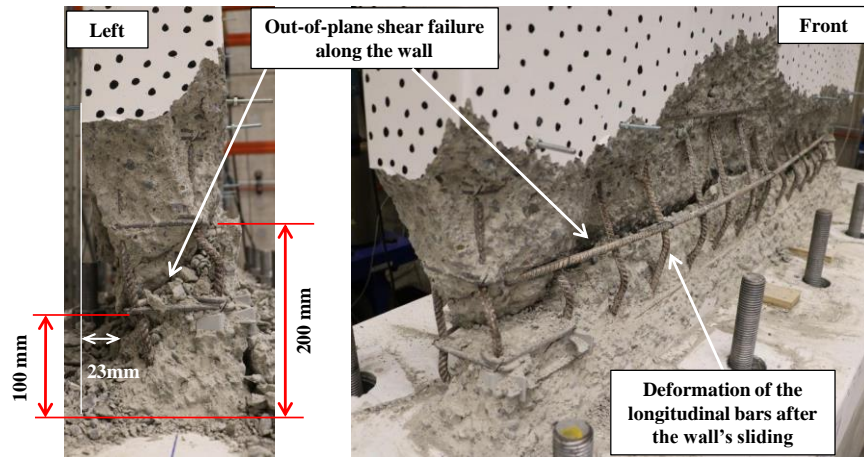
Specimen SP2-ND failure mode after removing the concrete spalling pieces
